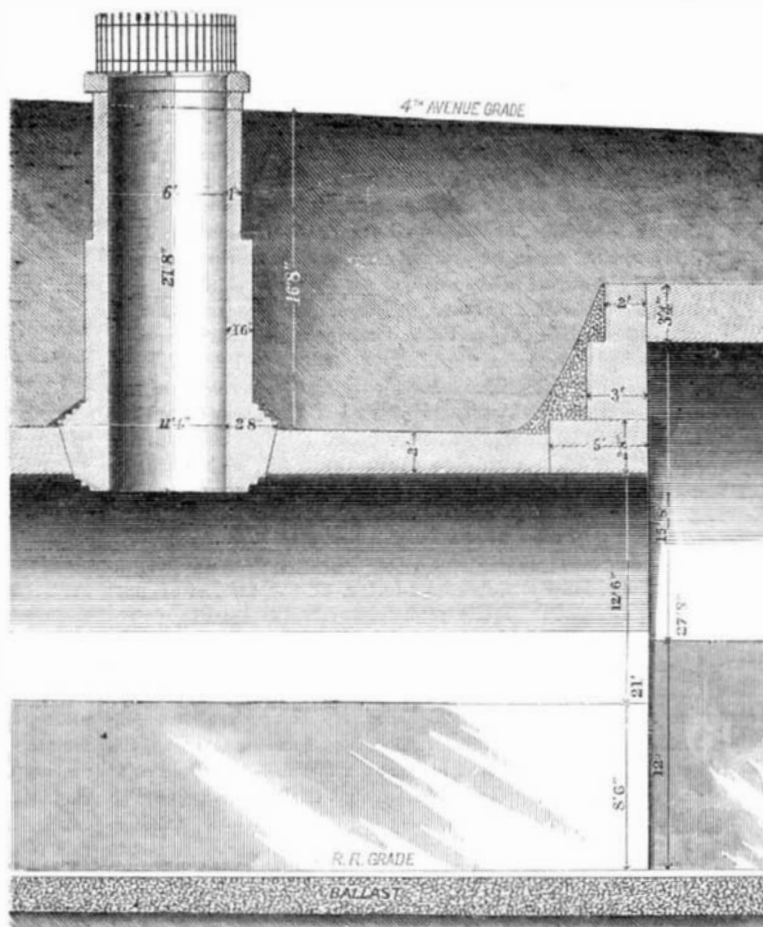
THE UNDERGROUND RAILWAY IN NEW YORK.—JUNCTION OF THE TUNNELS NEAR 96th STREET.
